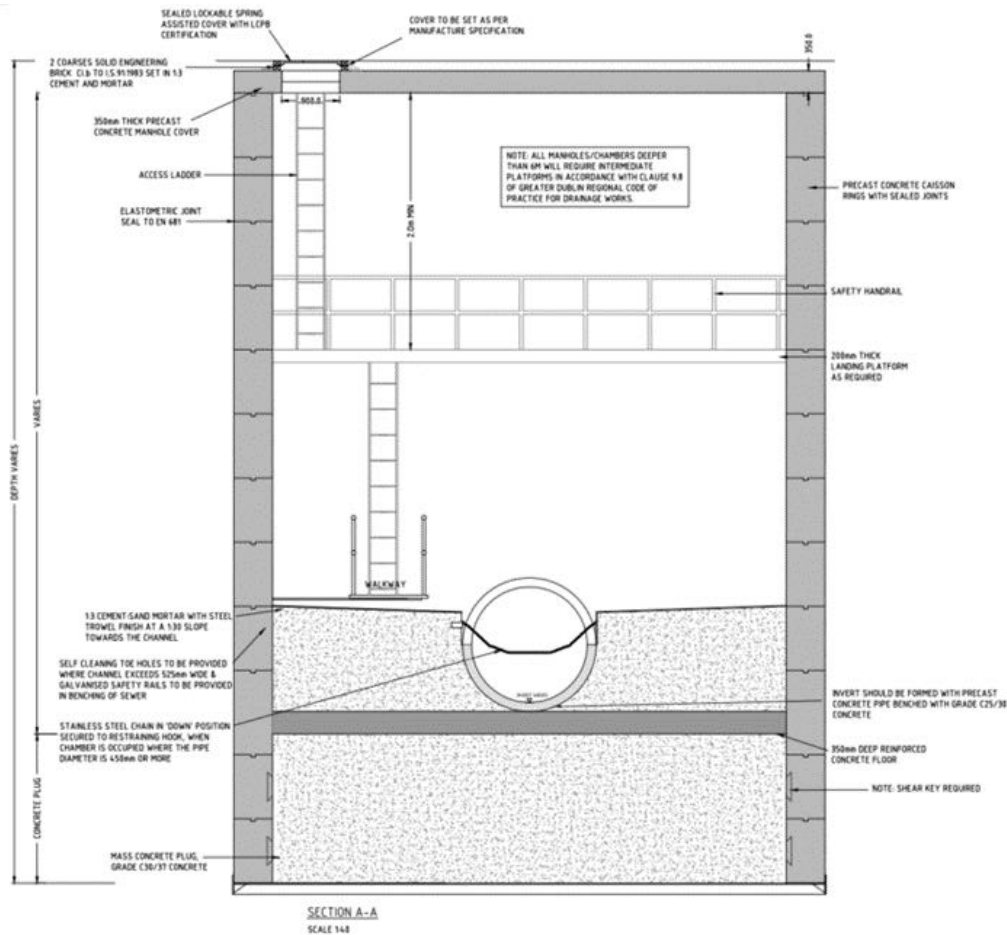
Typical top down caisson construction of a tunnel shaft
